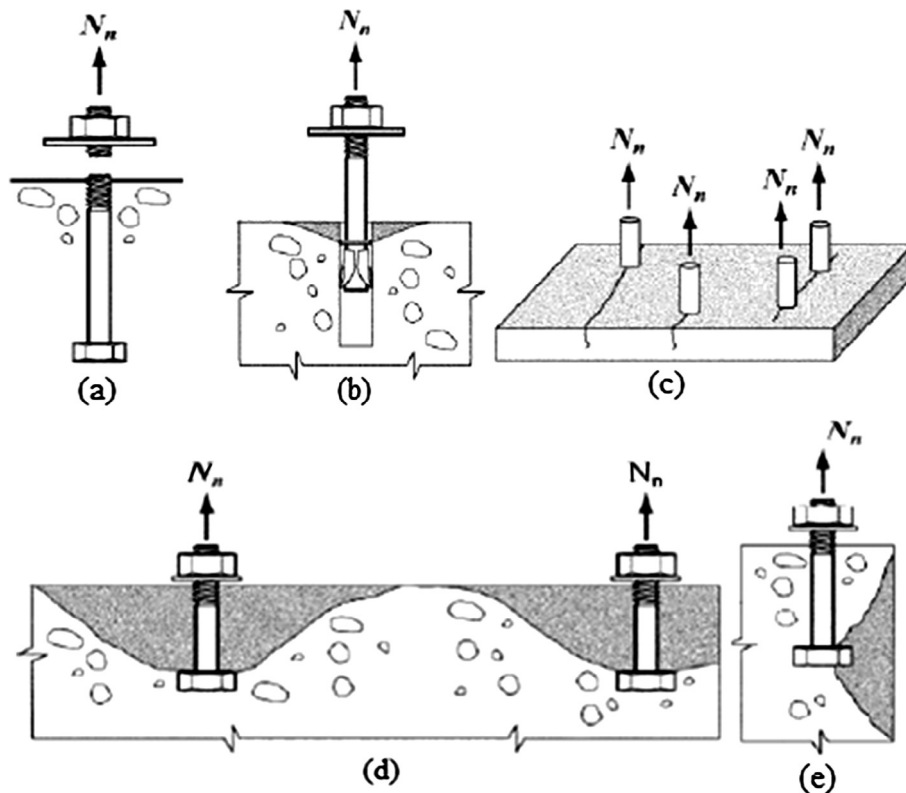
Anchorage failure mechanisms, (a) Steel Failure (b) Pullout (c) Concrete Splitting (d) Concrete Breakout, (e) Side-face Blowout.
